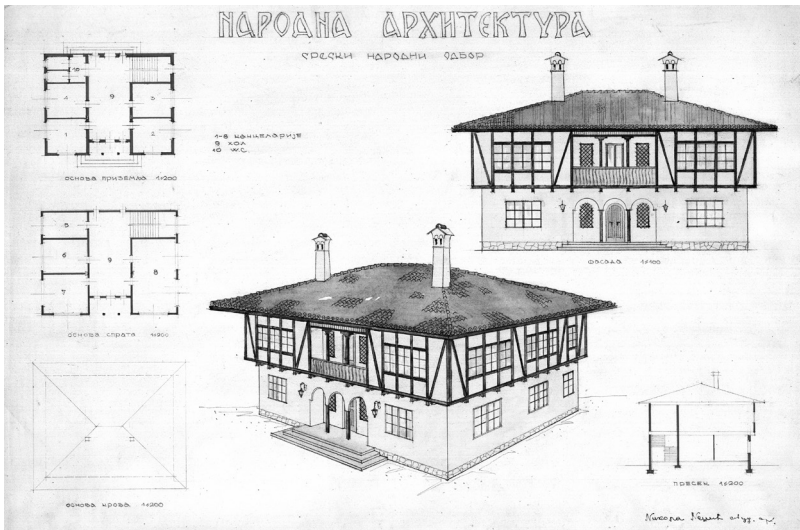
Project for the rural national committee house – ground floor, first floor, roof base, vertical section, main facade and perspective view, student: Nikola Nešić
